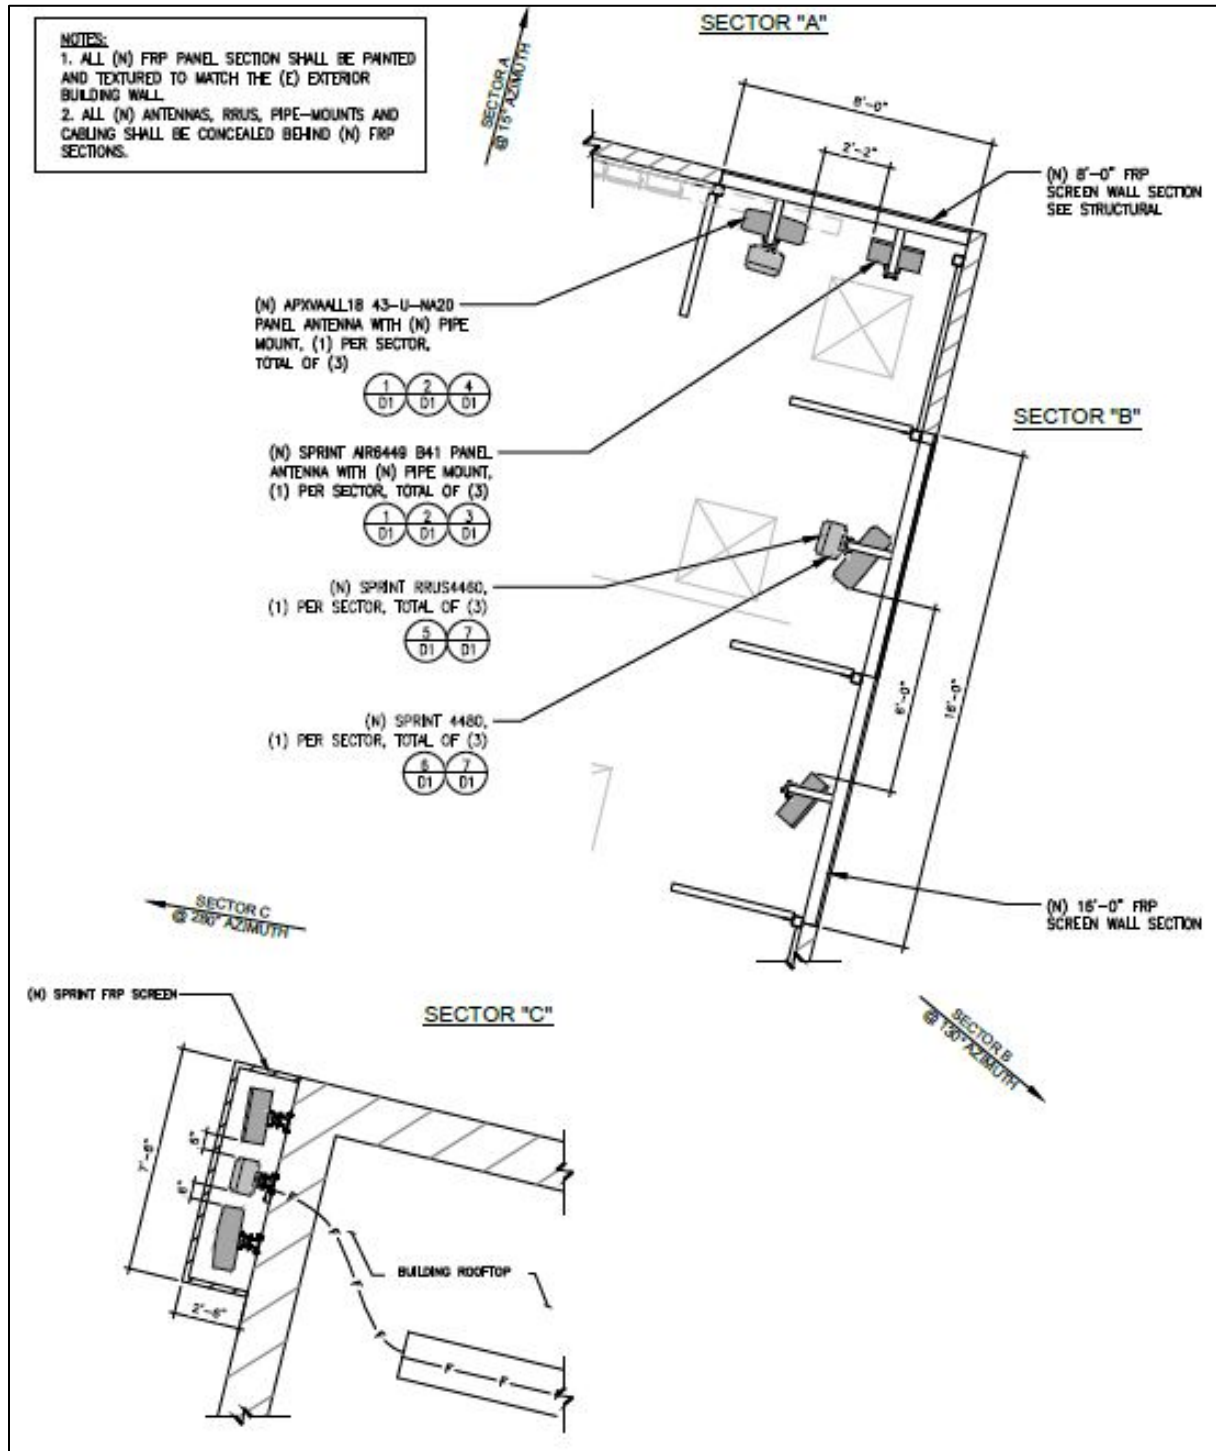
Proposed antenna layout plan (Source: Plans, page A-4, panel 2).
